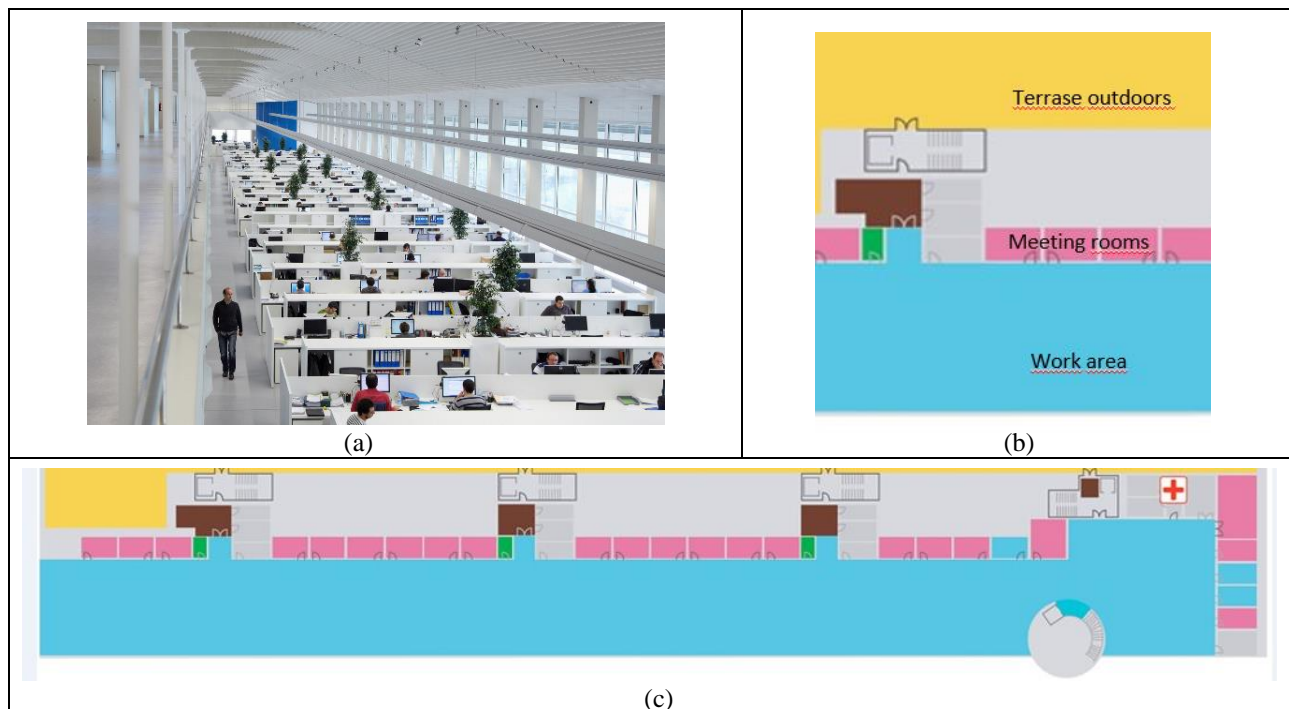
Test bed setting: (a) image (b) floor plan of mid-section (c) floor plan
